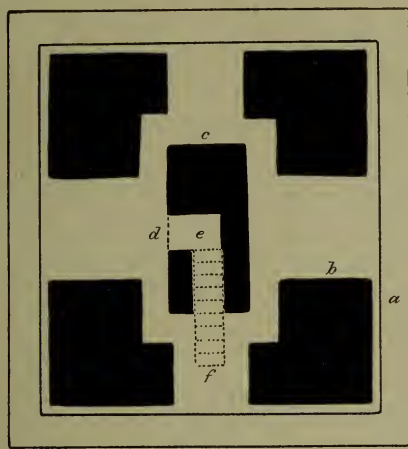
GROUND PLAN OF FIRST STORY OF TOWER.
